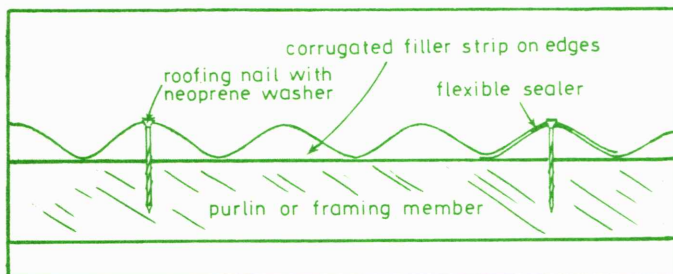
Fastening detail of corrugated fiberglass panels. Special nails with neoprene washers are used to fasten panels. Nail holes are predrilled through the top of corrugations to keep water out.
